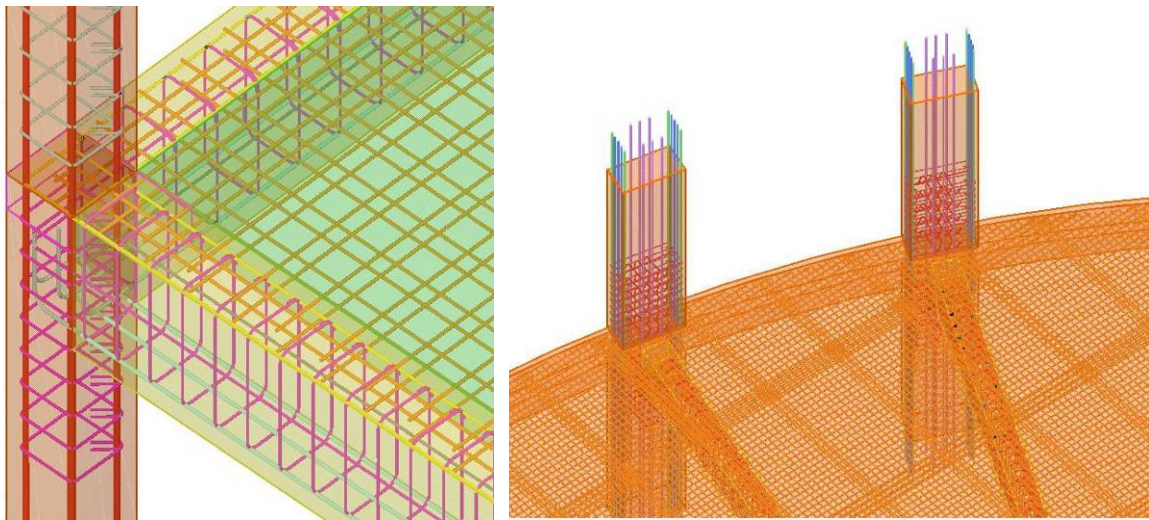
3D parametric models of cast-in-place reinforced concrete elements.
